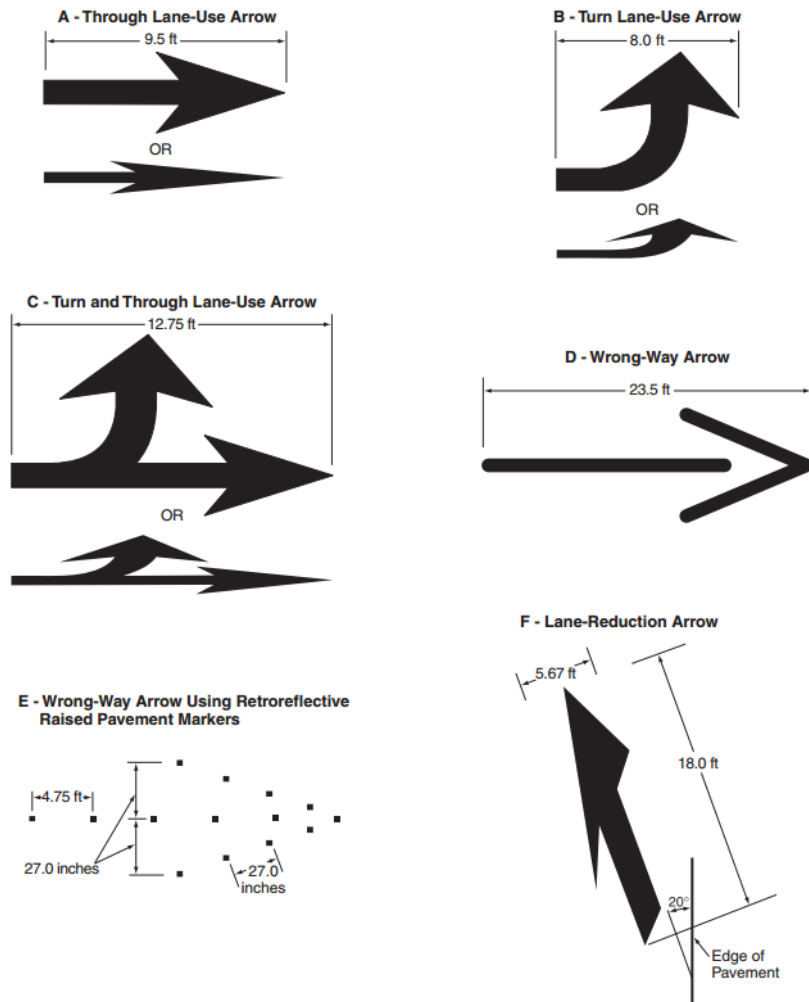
MUTCD Examples of Standard Arrows for Pavement Markings (MUTCD 2009)
